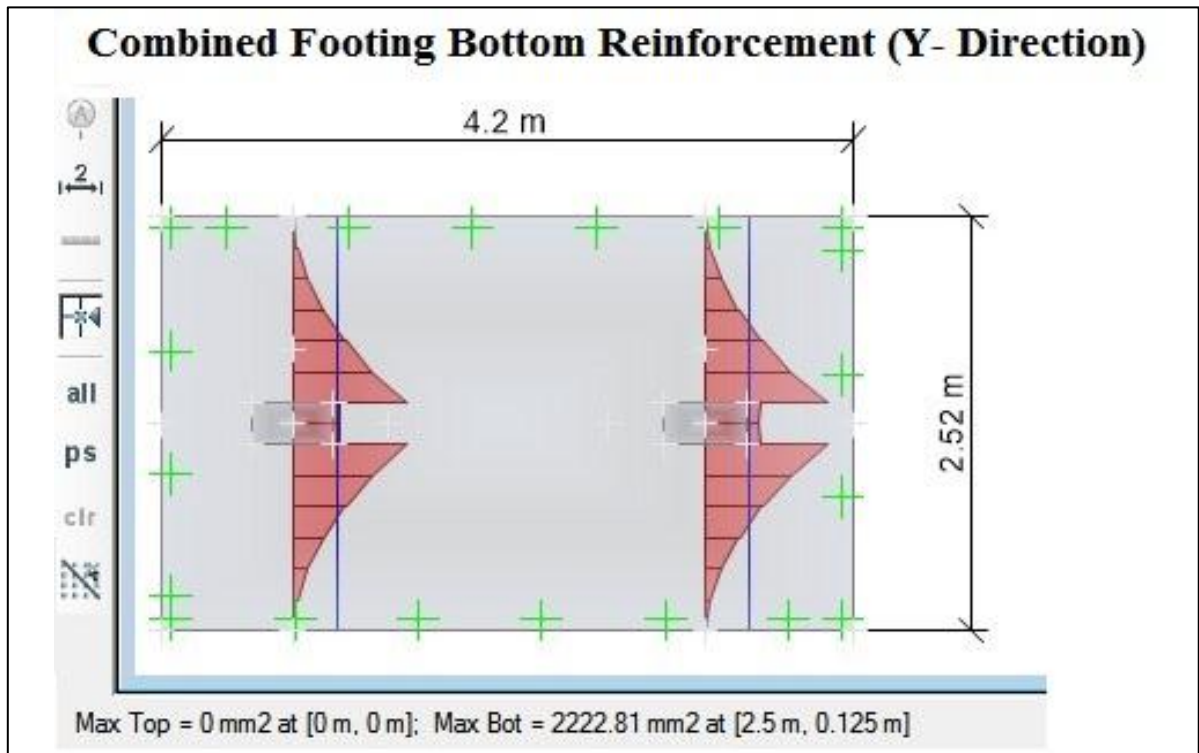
Combined Footing Bottom Reinforcement (Y- Direction)
